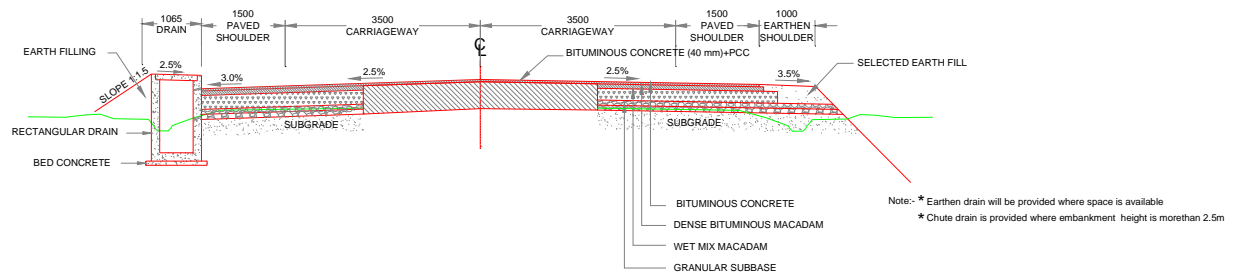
TYPICAL CROSS SECTION- TYPE-6
